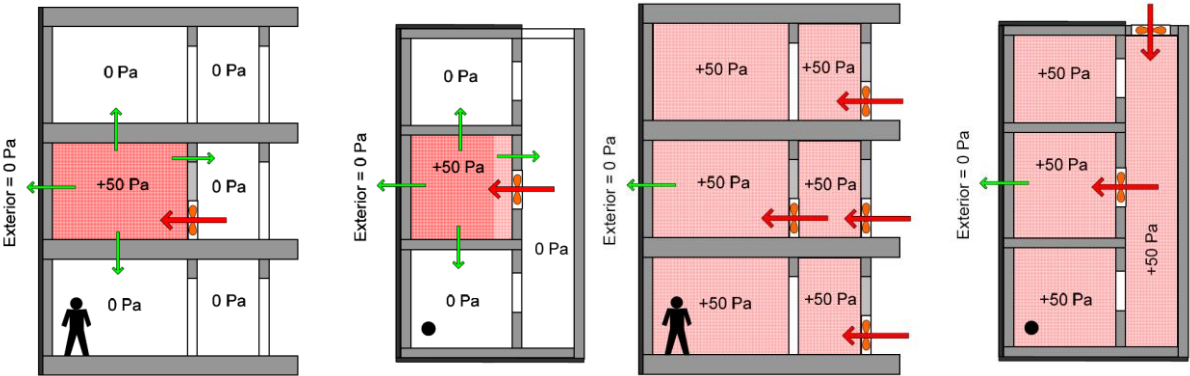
Single zone test with adjacent zones open to exterior (two left figures: section and plan view of test floor) and guarded zone test with adjacent zones pressurised to equal pressure (right figures) (Ricketts, 2013)
